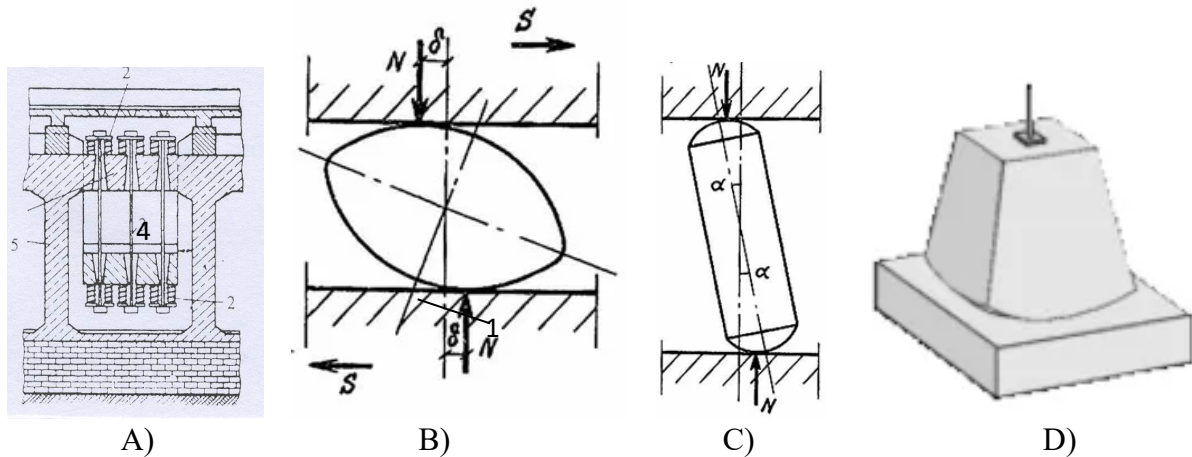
A) Cross-section of a reinforced concrete frame-seismic shock absorber of a building in Ashgabat; B,C,D) Different type of Kinematic supports types
